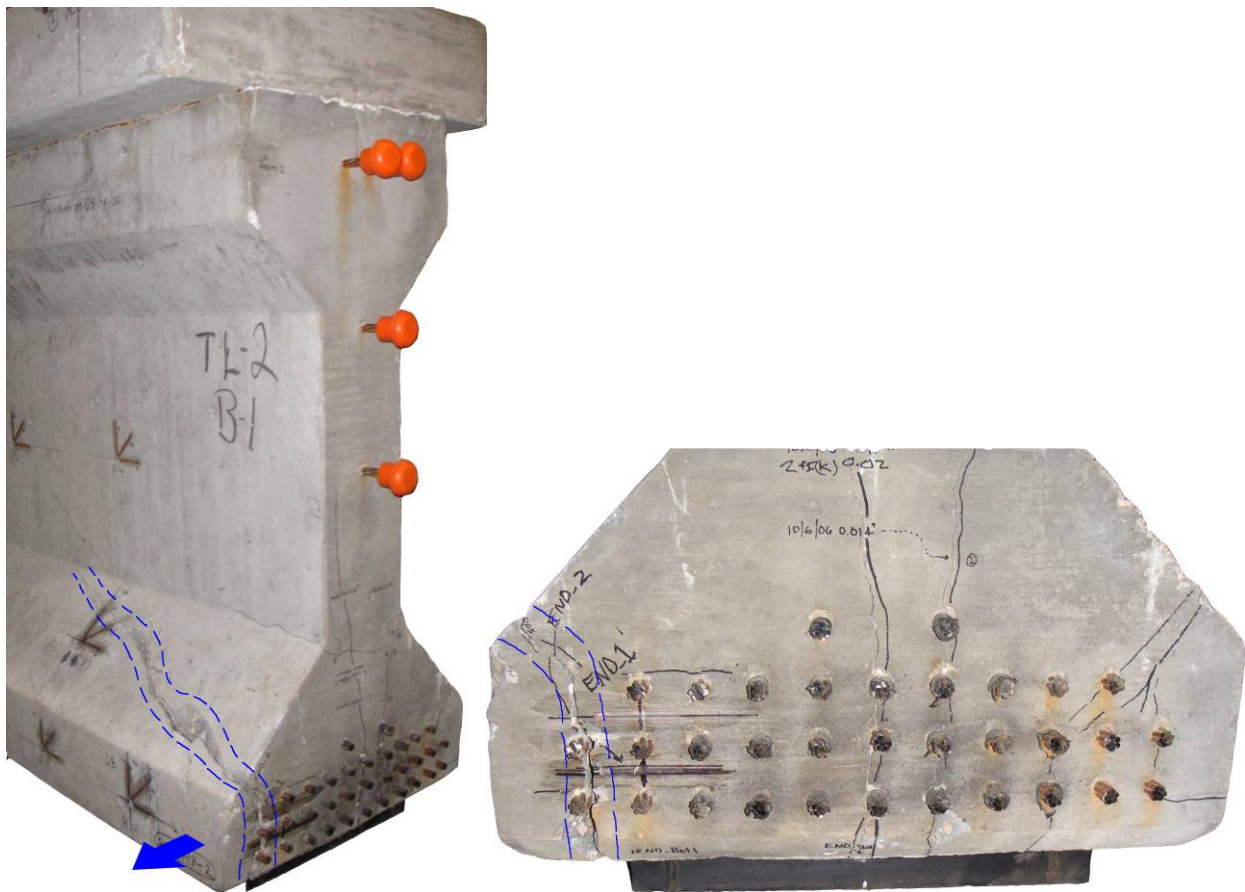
Bulb cracking pattern caused by excessive debonding under the web.
